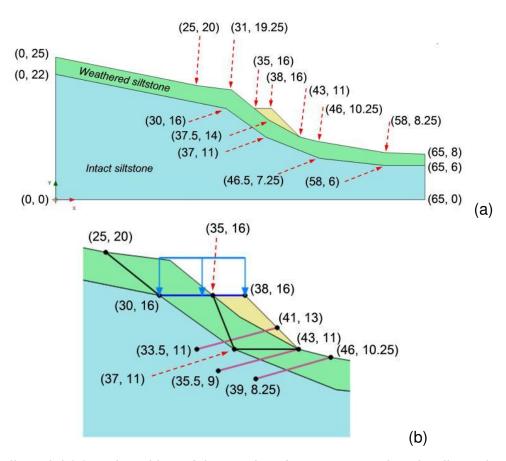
Soil model (a) and position of the road surface, construction details and soil nails (b)
